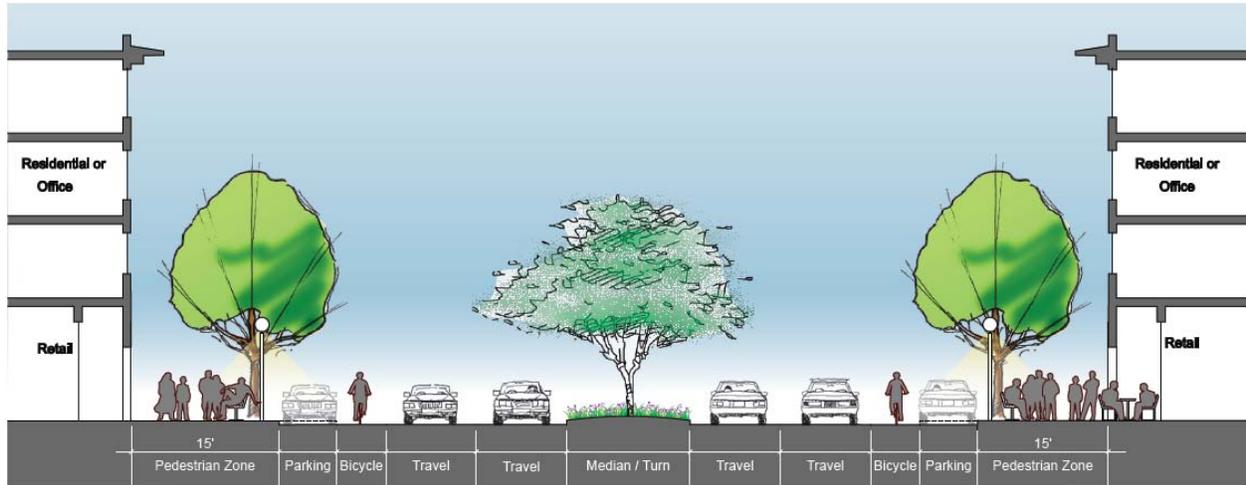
65th Street between Elvas Avenue and Folsom Boulevard
